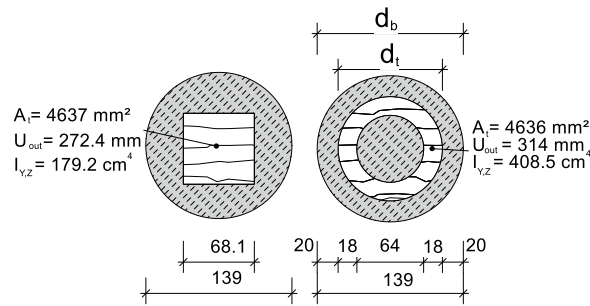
Cross-section of a cement-grouted bore hole with rectangular reinforcement member (left) and a circular hollow section member (right); all dimensions in millimeters
